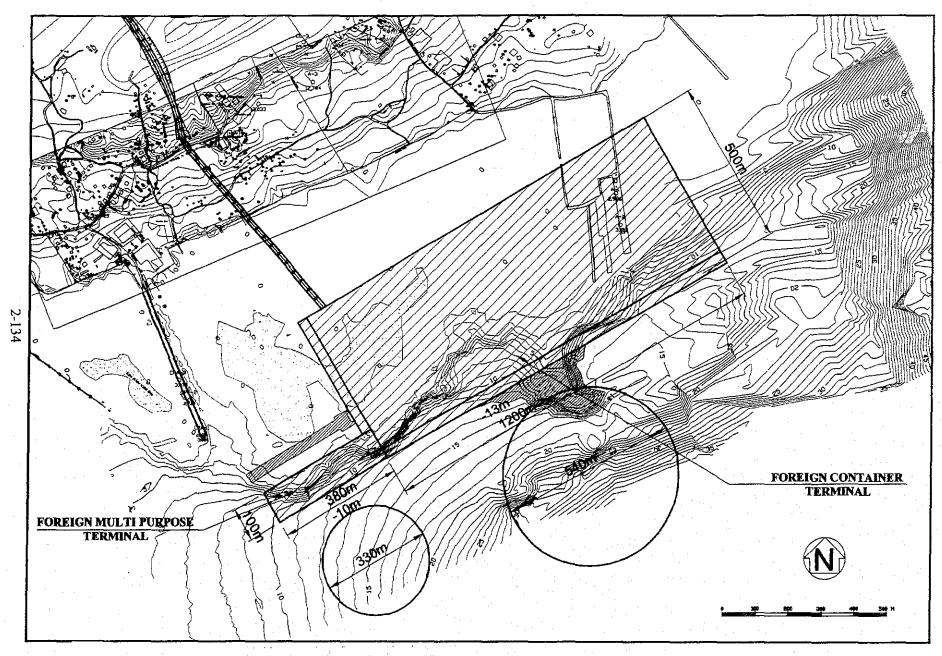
New Cebu Port Layout Plan (alternative 2)
